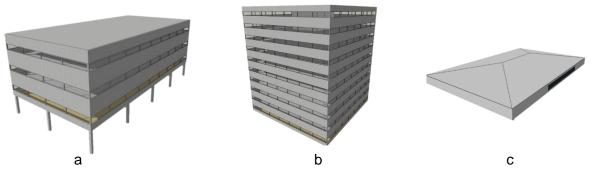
Graphical models of the archetypical buildings used in EWE simulations – a: 3-storey office building, b: 10-storey office building, c: Supermarket.
